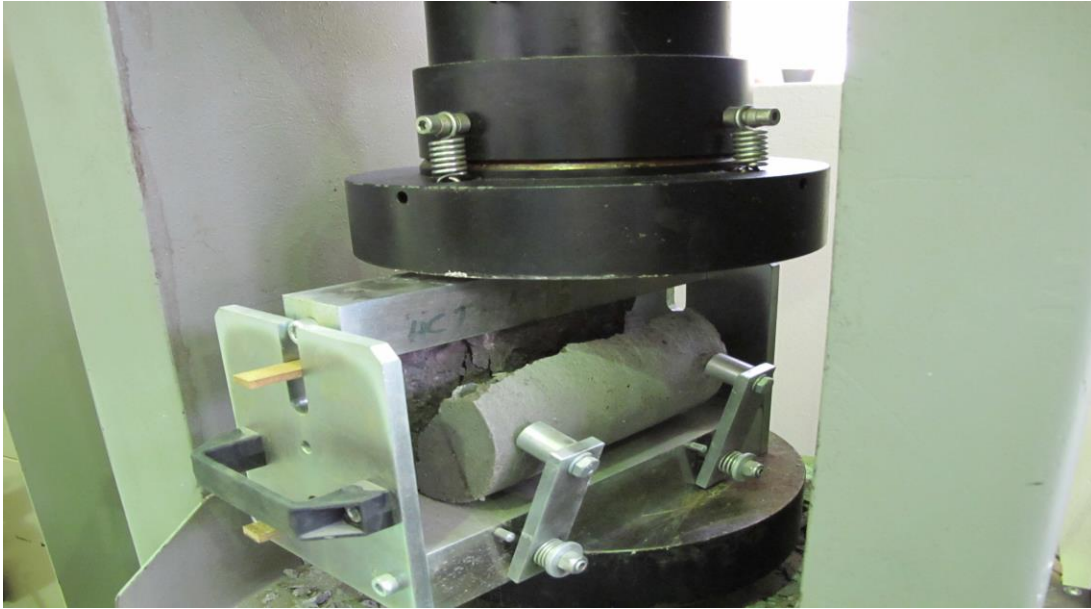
Failure mode of Steel Fibres concrete cylinder tested in compression.
